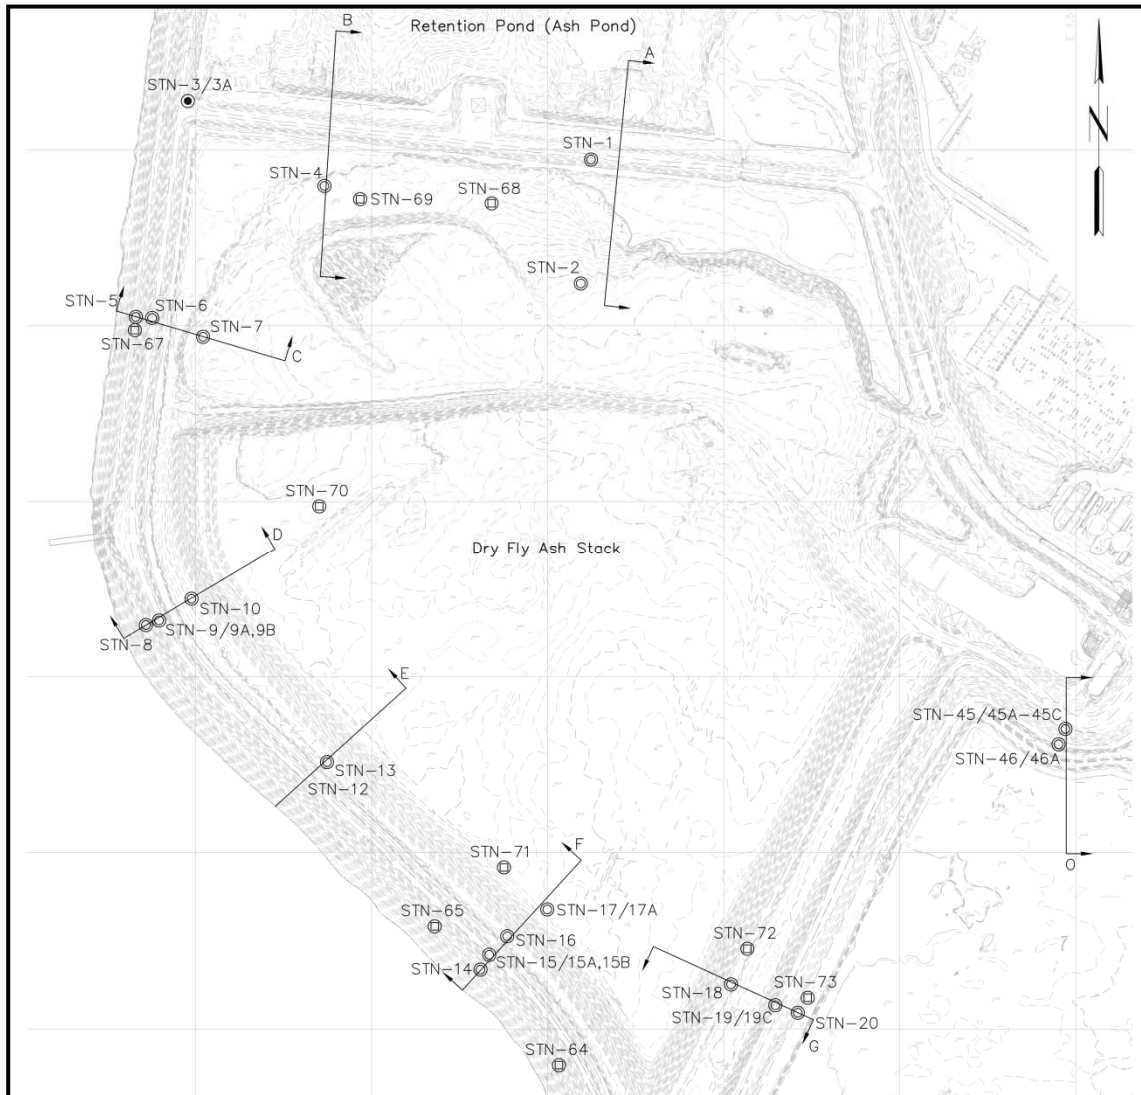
Plan View of the Dry Fly Ash Stack and the Stability Cross-Sections
